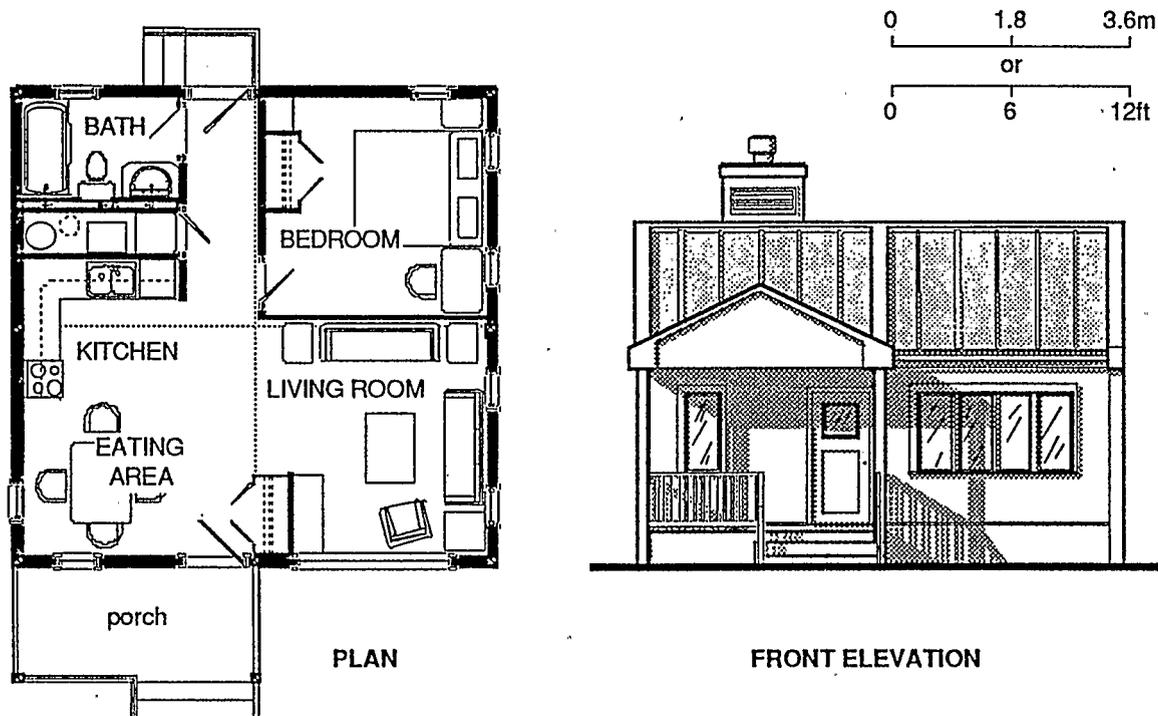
Plan with possible furniture layout, and elevation of *Core House A
